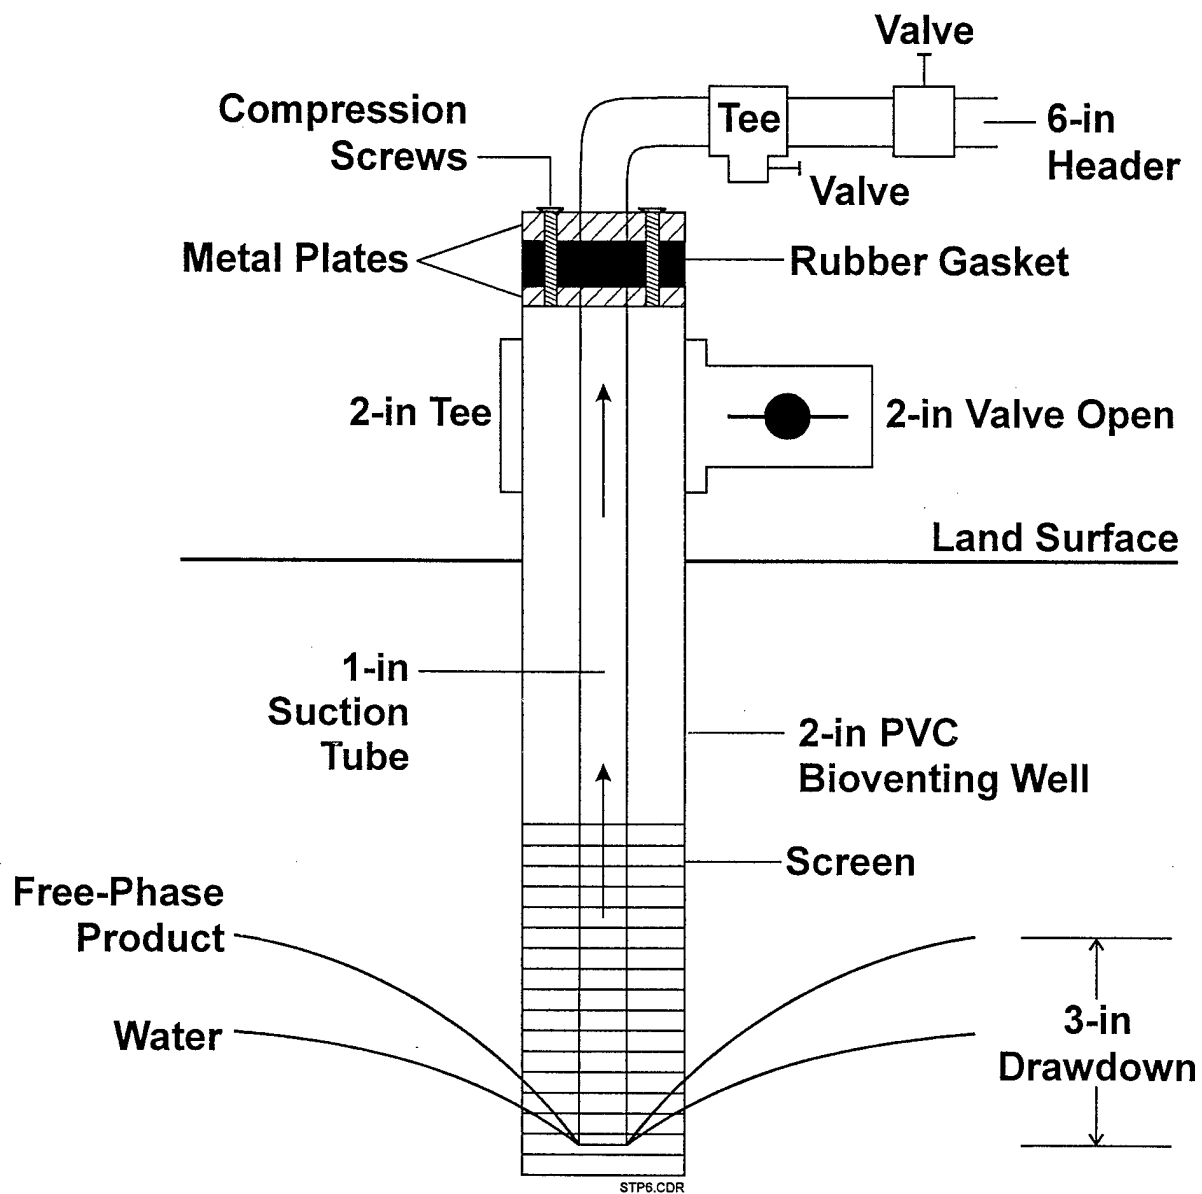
Slurper Tube Placement and Valve Position for the Drawdown Pump Test
